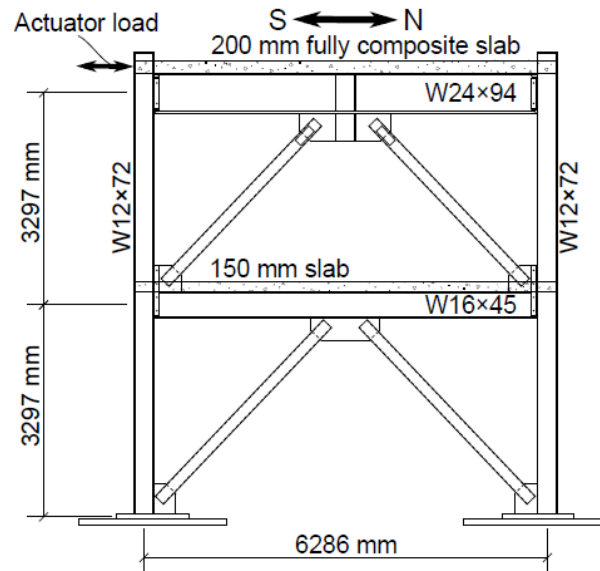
NCREE two-story test frame elevation (Sen 2014).
